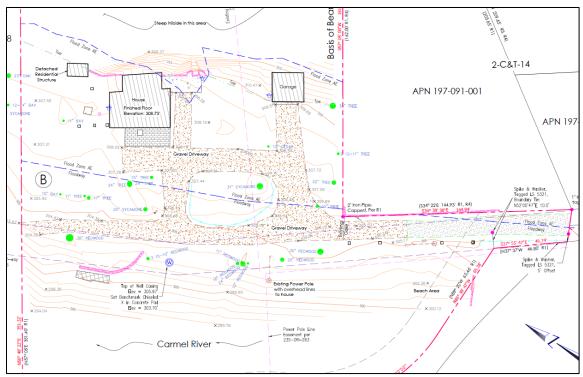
Relevant portion of project site plan with existing structures, prepared by Polaris Land Surveying, May 2023.
